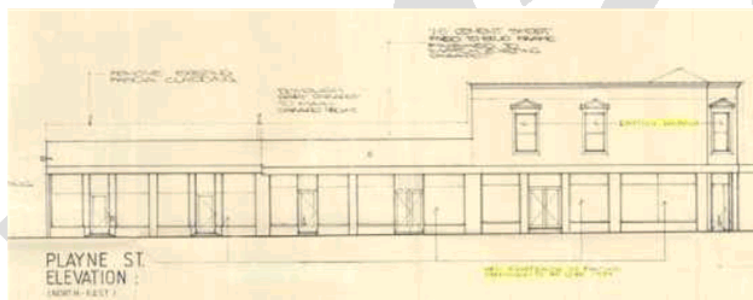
Drawings dating to 1990, showing proposed works. Annotations note the removal of the existing metal cladding/parapet from the parapet and first floor, and at ground level, the installation of new shopfronts (since altered) (FCC PB).
